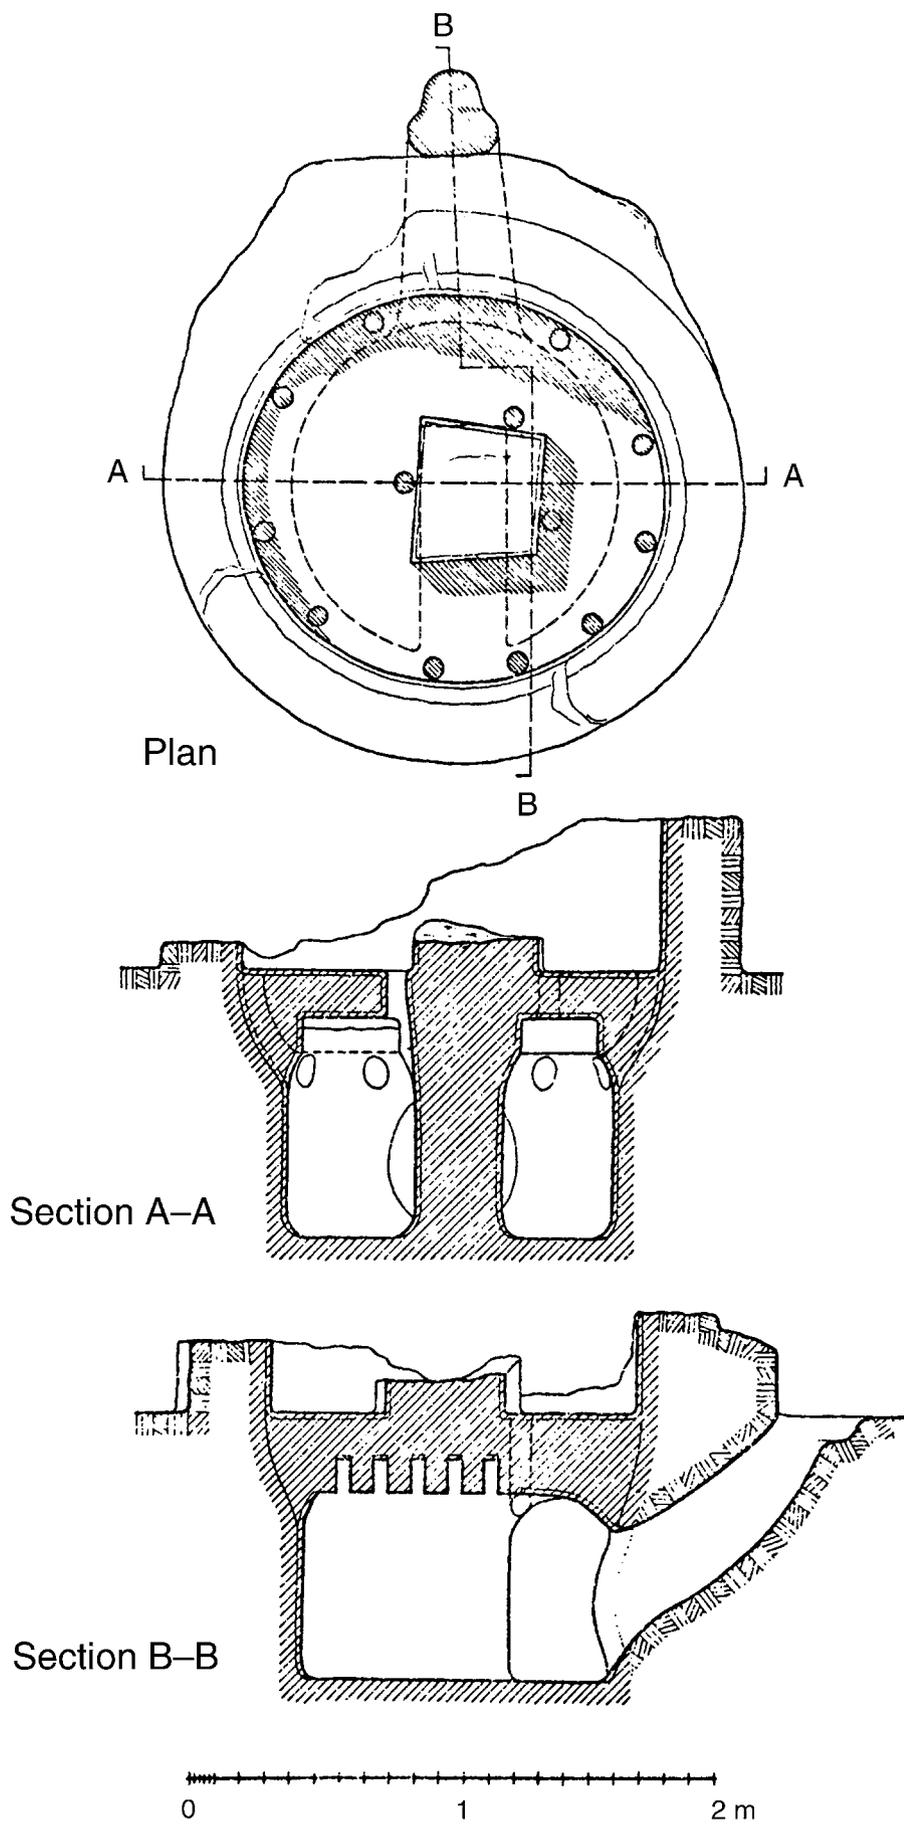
Top Plan and Section Drawings of the Earliest Pottery Kiln in Square BB 37
